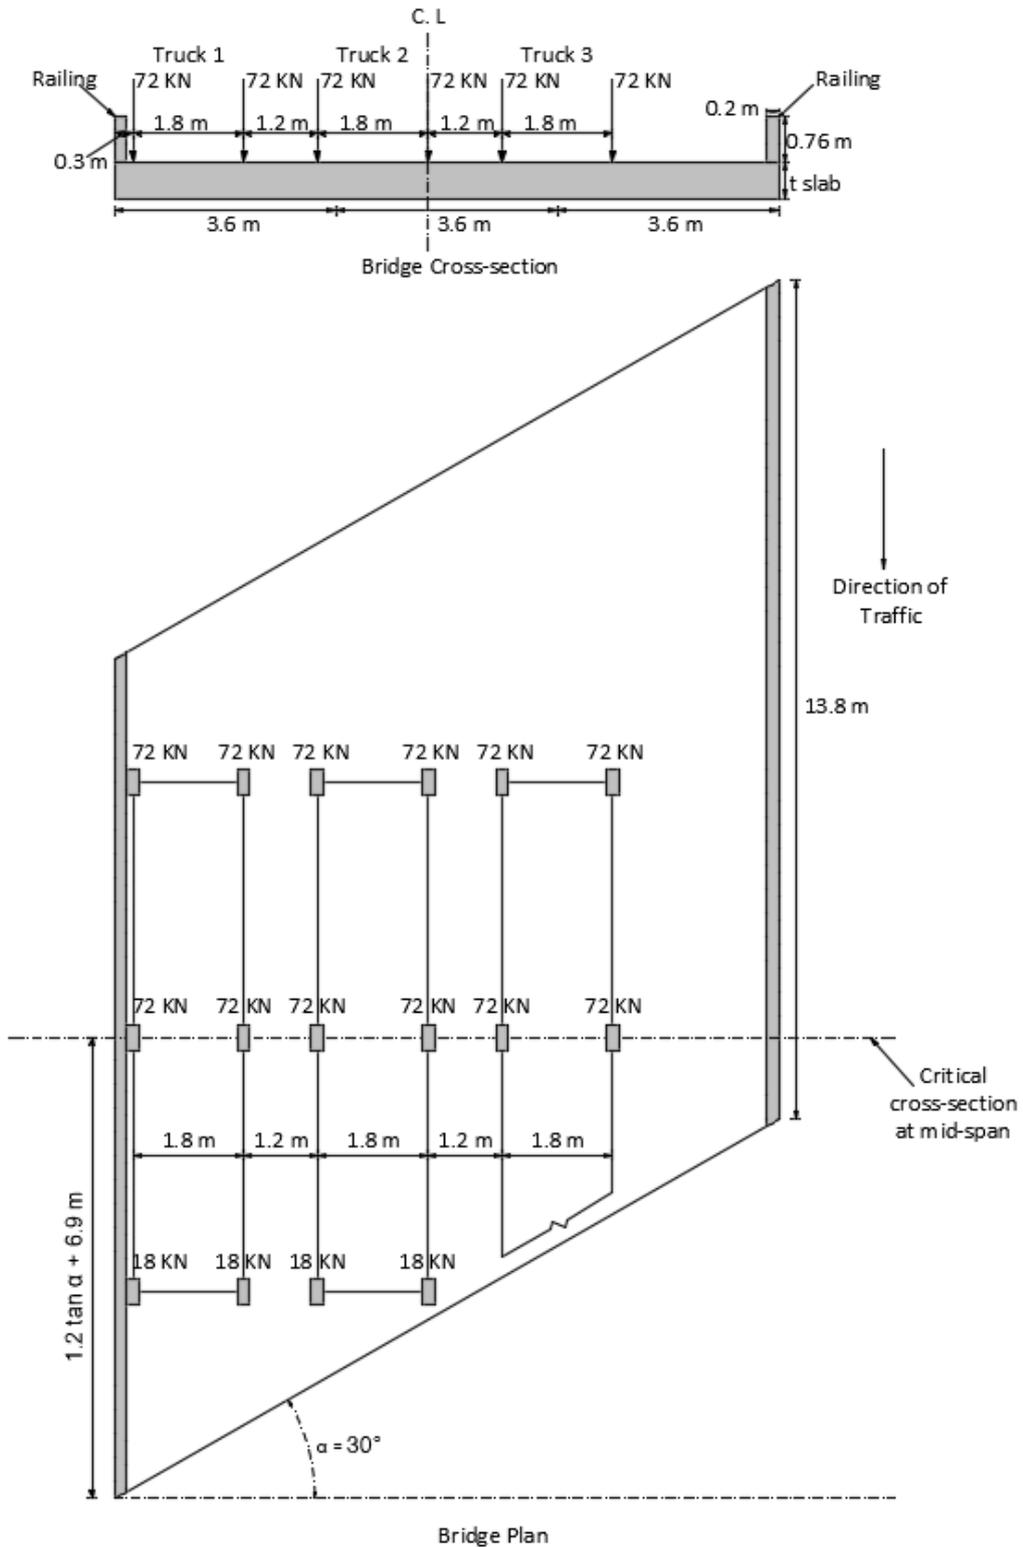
Typical cross-section and layout for a 13.8 m (46 ft) span, three-lane, 30 degrees skewed bridge with railings, subject to HS20 Edge loading condition
